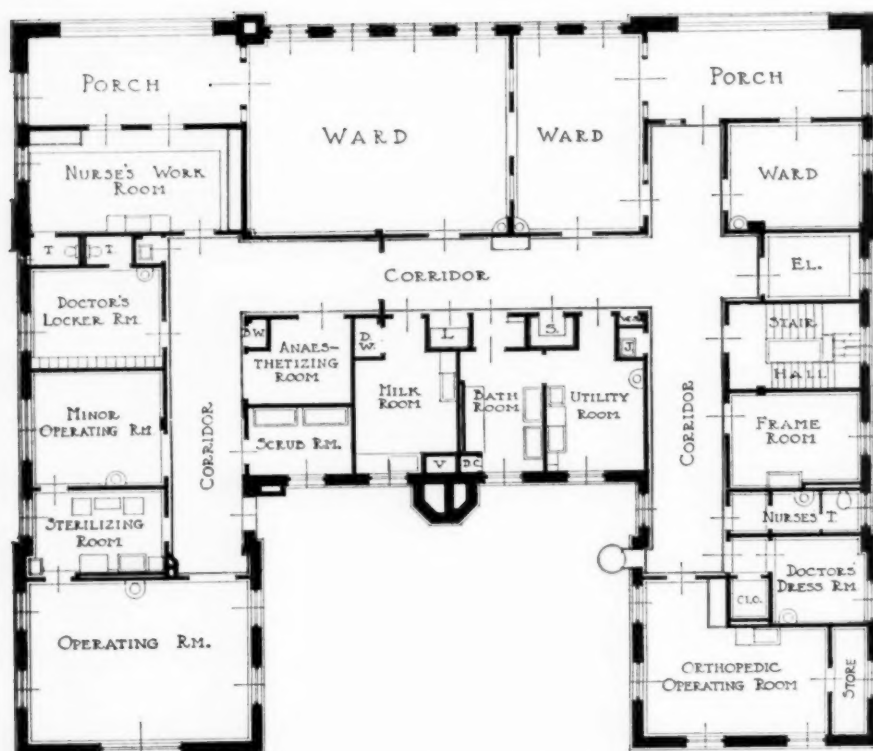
Denver Children's Hospital. Fourth floor plan.
